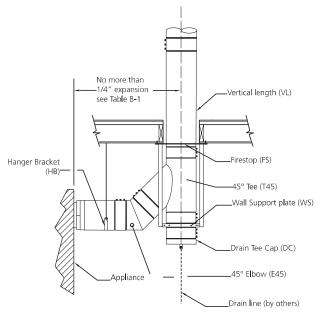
Single axis 45° Tee (T45) support from floor and ceiling
